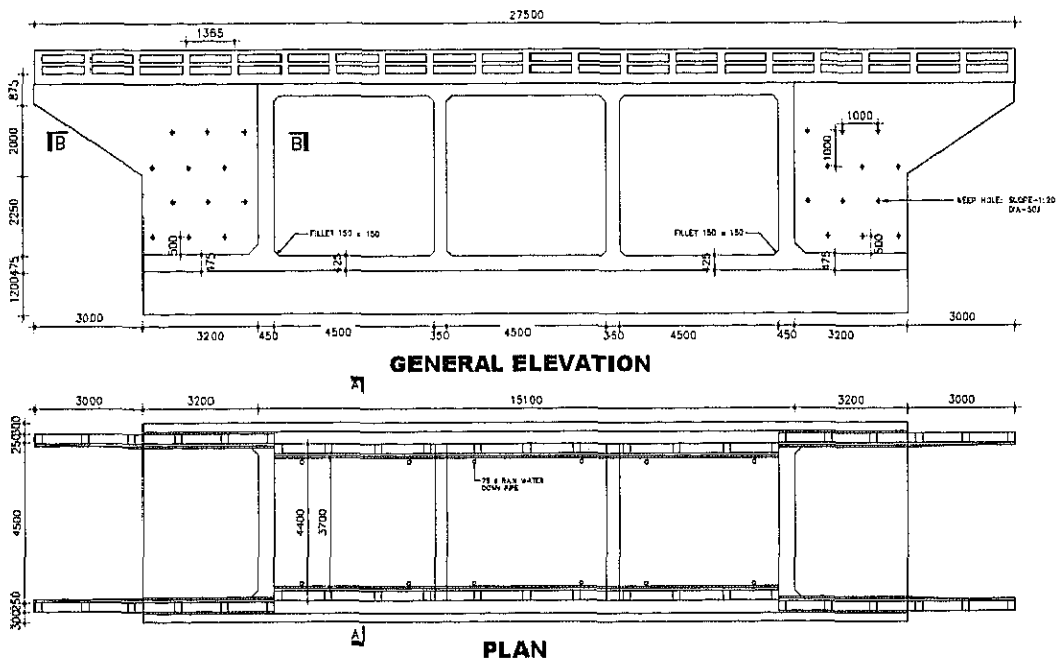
Plan of RCC bridge with single lane (Union road)
